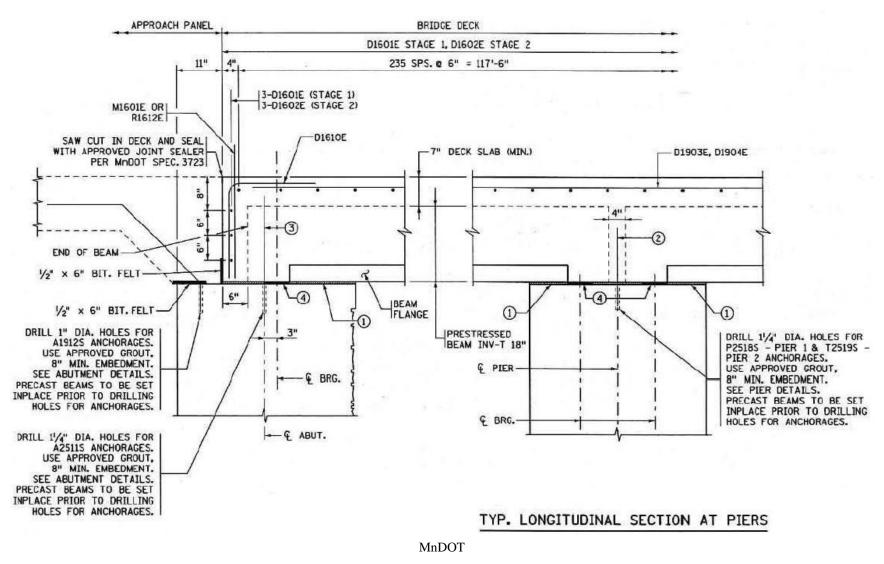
Longitudinal section showing bearings (Circle 4), anchoring dowels (Circle 3), and single layer of deck reinforcement
